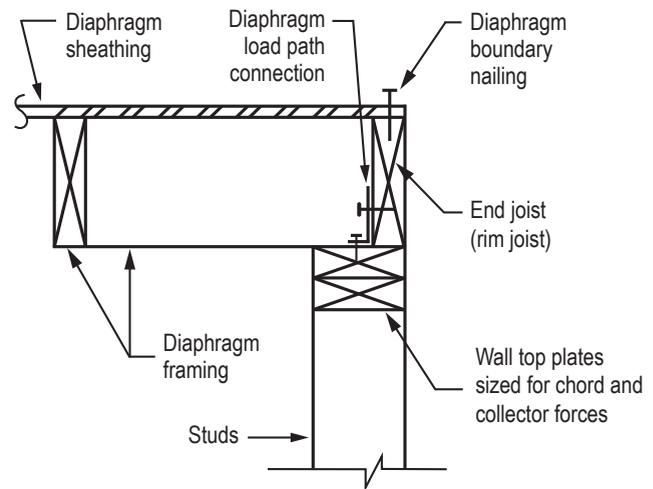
Wall top plate acting as chord boundary element. The same top plate can also act as the collector boundary element.
